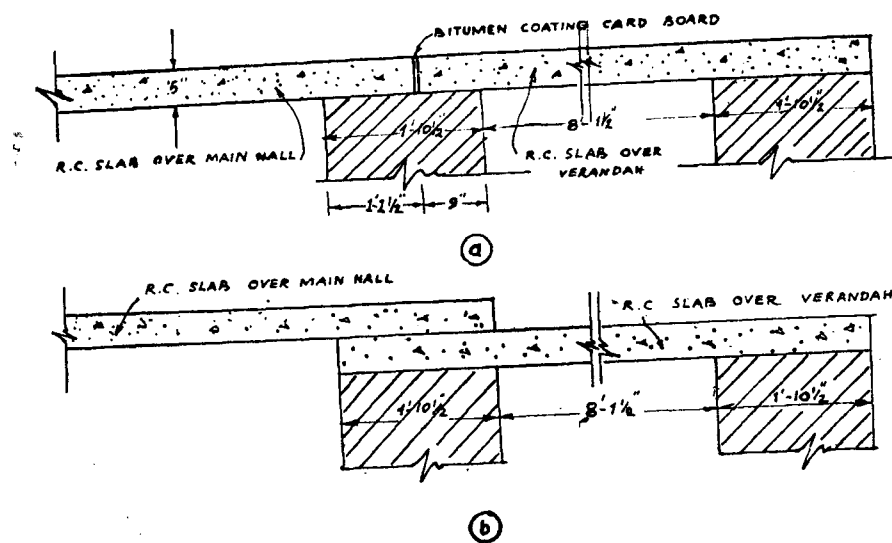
(a) & (b). Alternative arrangements for roof slab
